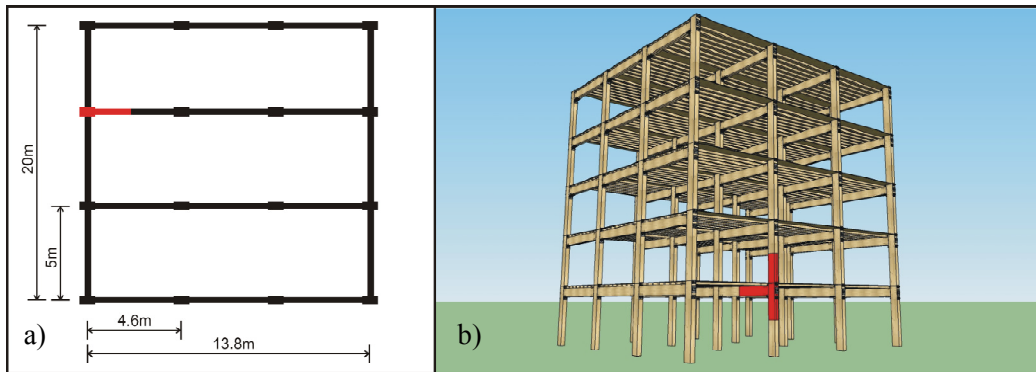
Prototype structure a) in plan and b) rendering showing beam-column joint used for testing
